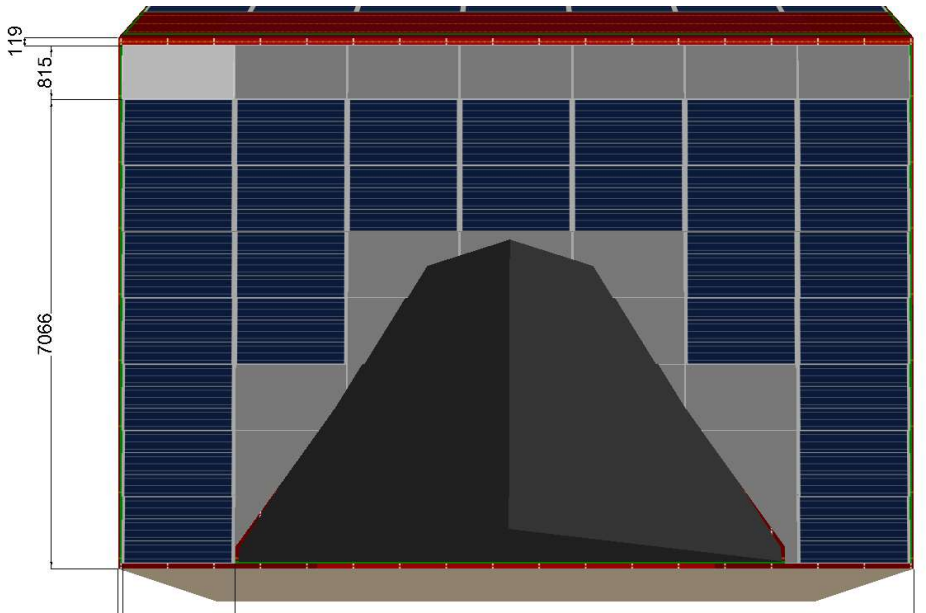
Planning layout roof with dormer and automatically filled dummy modules.
